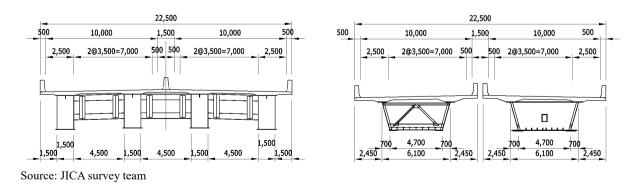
Cross Section of Long Span Bridge of Coastal Road
